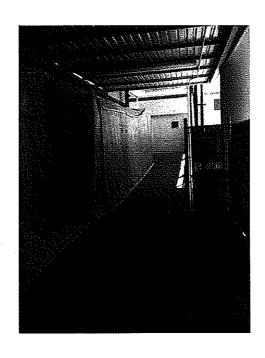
CONTAINMENT UNIT WEST WALL (SOUTH SECTION)
